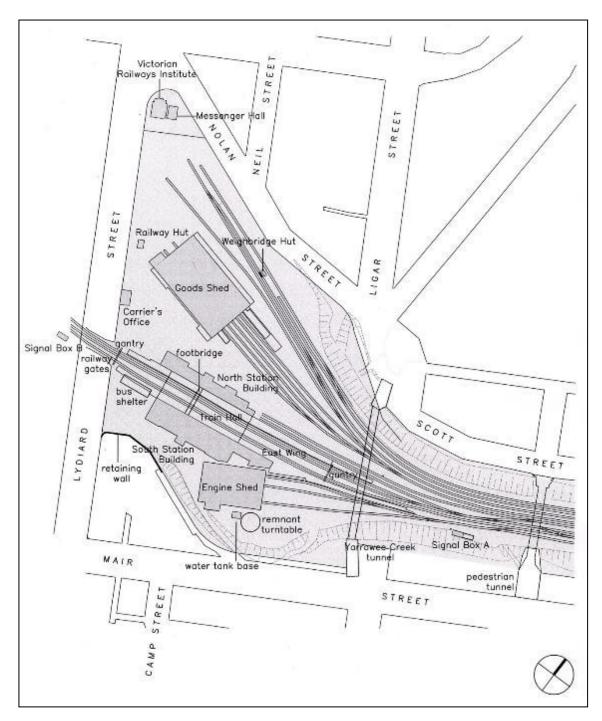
Plan of station precinct, showing buildings and structures within the railway reserve Source: 2002 CMP
